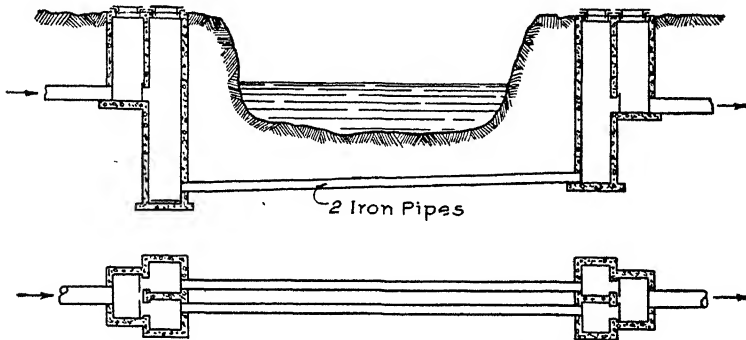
Sectional Elevation and Plan of Inverted Siphon.
